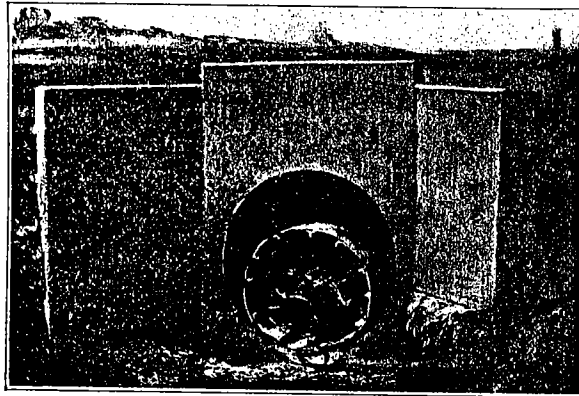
Core Collapsed for Removal from Completed Culvert.
